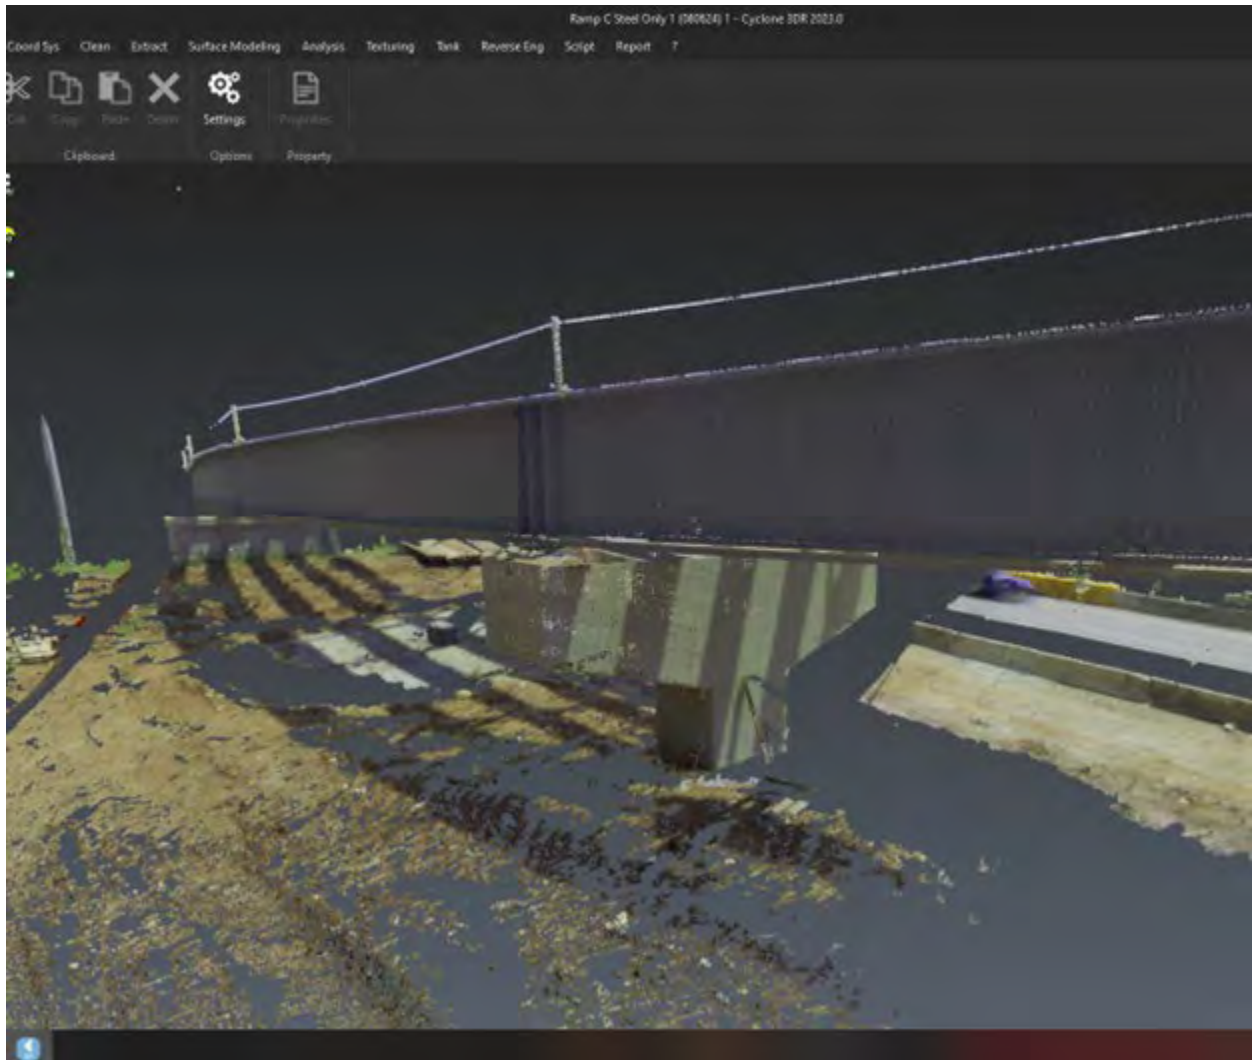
Point cloud of girder No. 1 at bent No. 6
